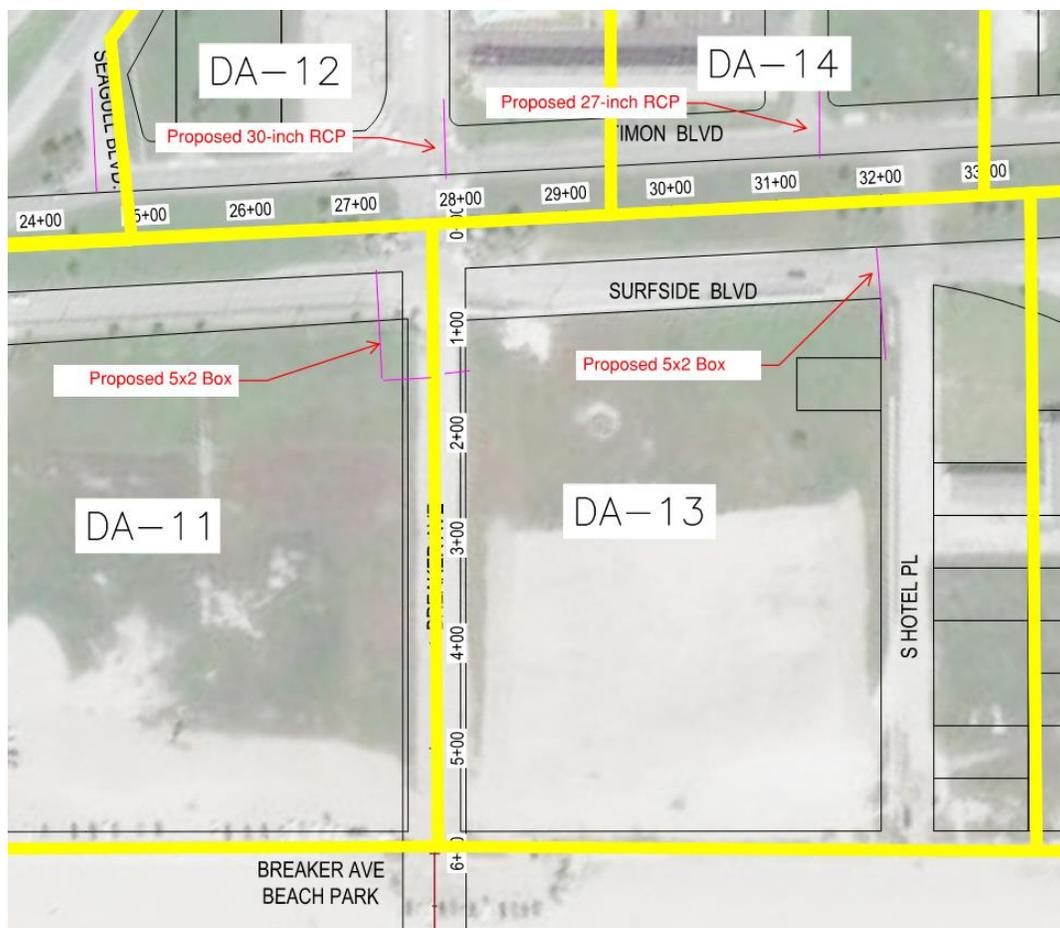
Snapshot of DA's 11-14 – connections to Navigable Canal
